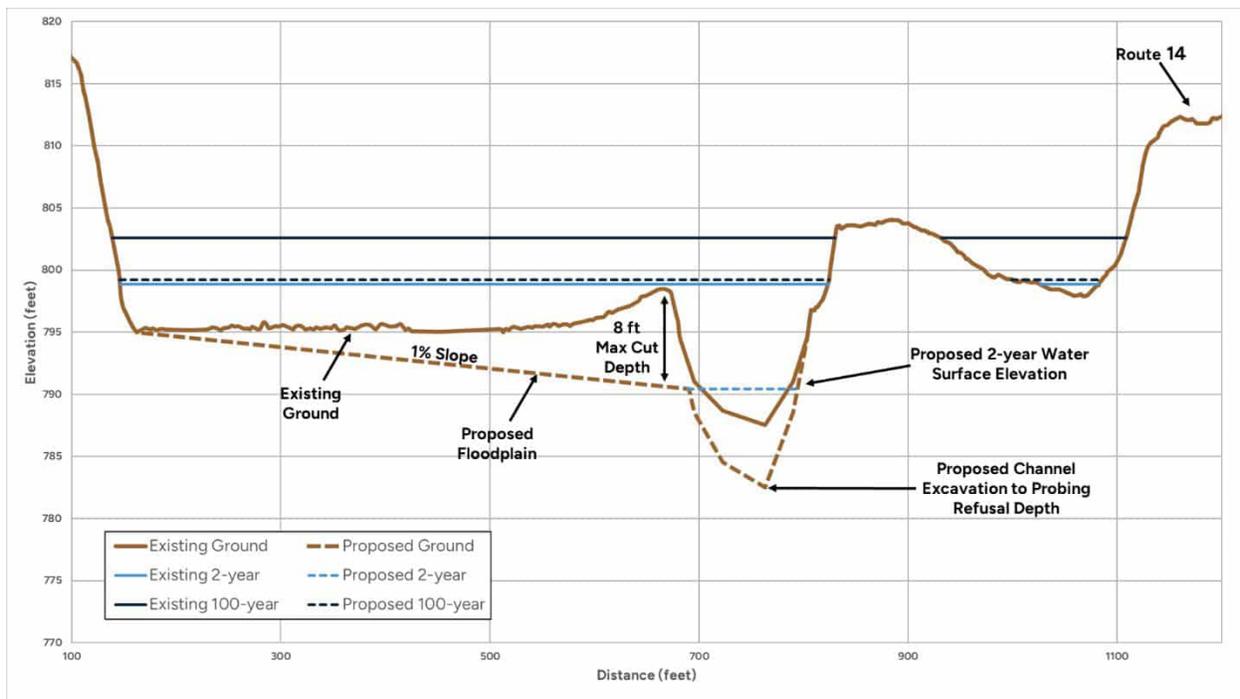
Cross section 500 feet upstream of the dam of Lamoille River and floodplain with existing and proposed conditions (model cross section 11.19)
